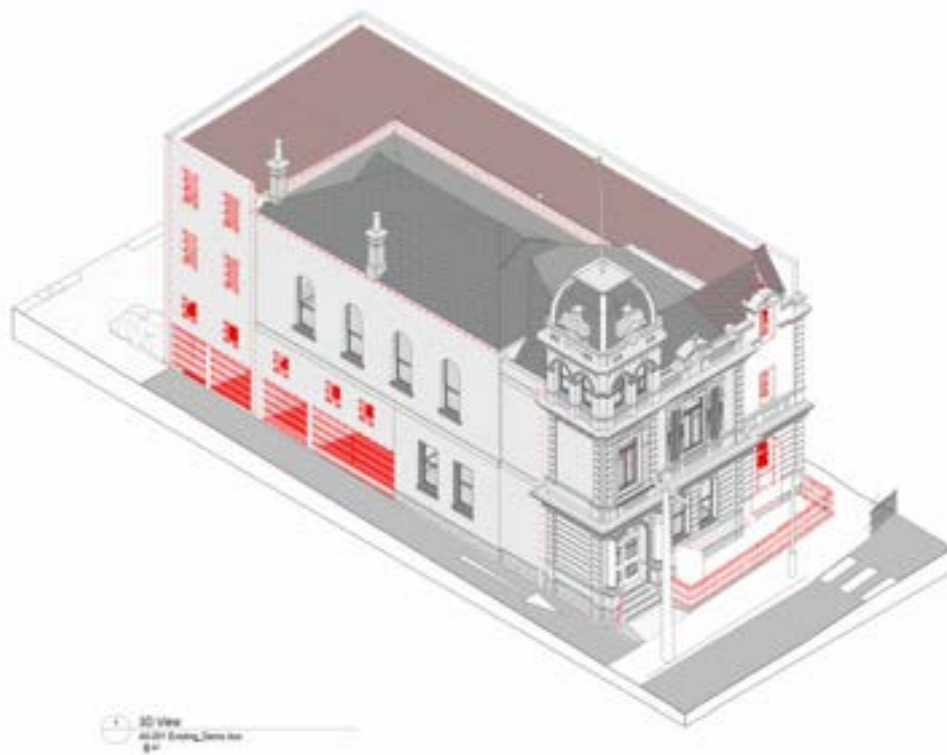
A0-001 Axonometric view of proposed demolition to the building's exterior. Source: Trethowan Architecture, 2025.
